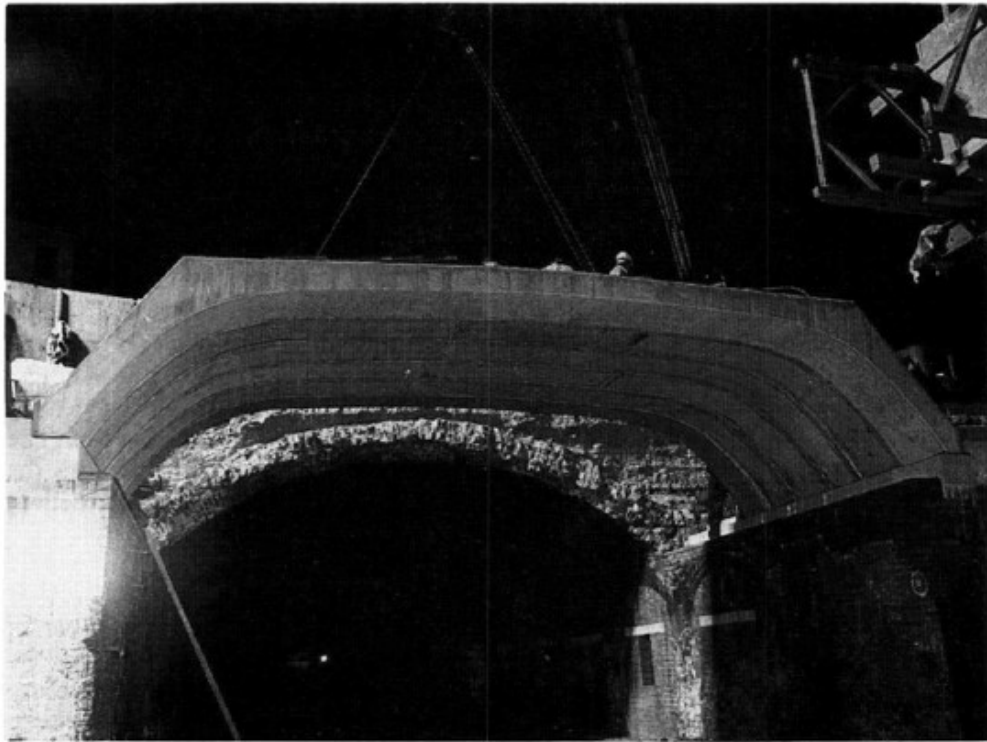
Precast concrete arch unit (Stevenson, 1987)
